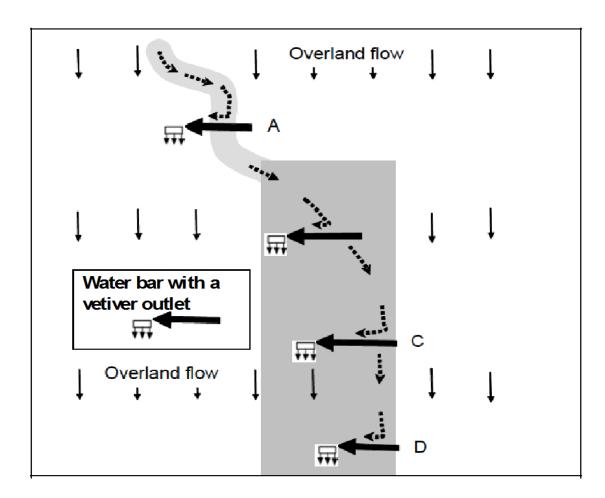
Using diversions (concrete or earthen water bar or rolling dip) to convey flow off and across the road surface—vetiver outlets are used to convey the flow back to the land and minimize erosion (QDERM, 2010a)
